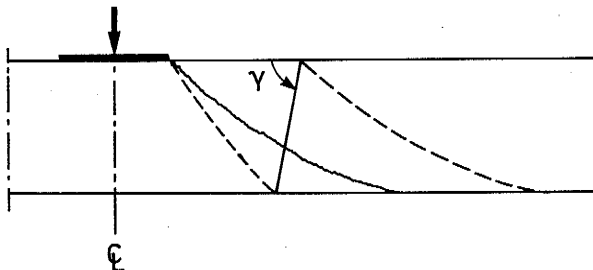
Punching of slab with shear reinforcement. With dotted lines are indicated possible failure surfaces not activating the reinforcement.
